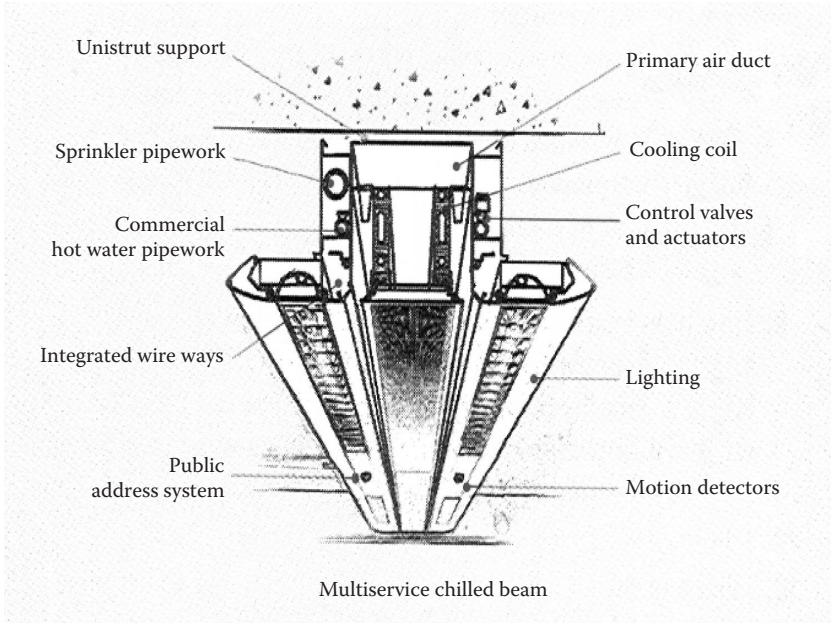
Diagram of chilled beams. (From Massachusetts Institute of Technology, *Chilled Beams Hit the Roof*, Cambridge, Massachusetts, Accessed on December 19, 2014, <http://mitei.mit.edu/news/chilled-beams-hit-roof>, 2009.)
